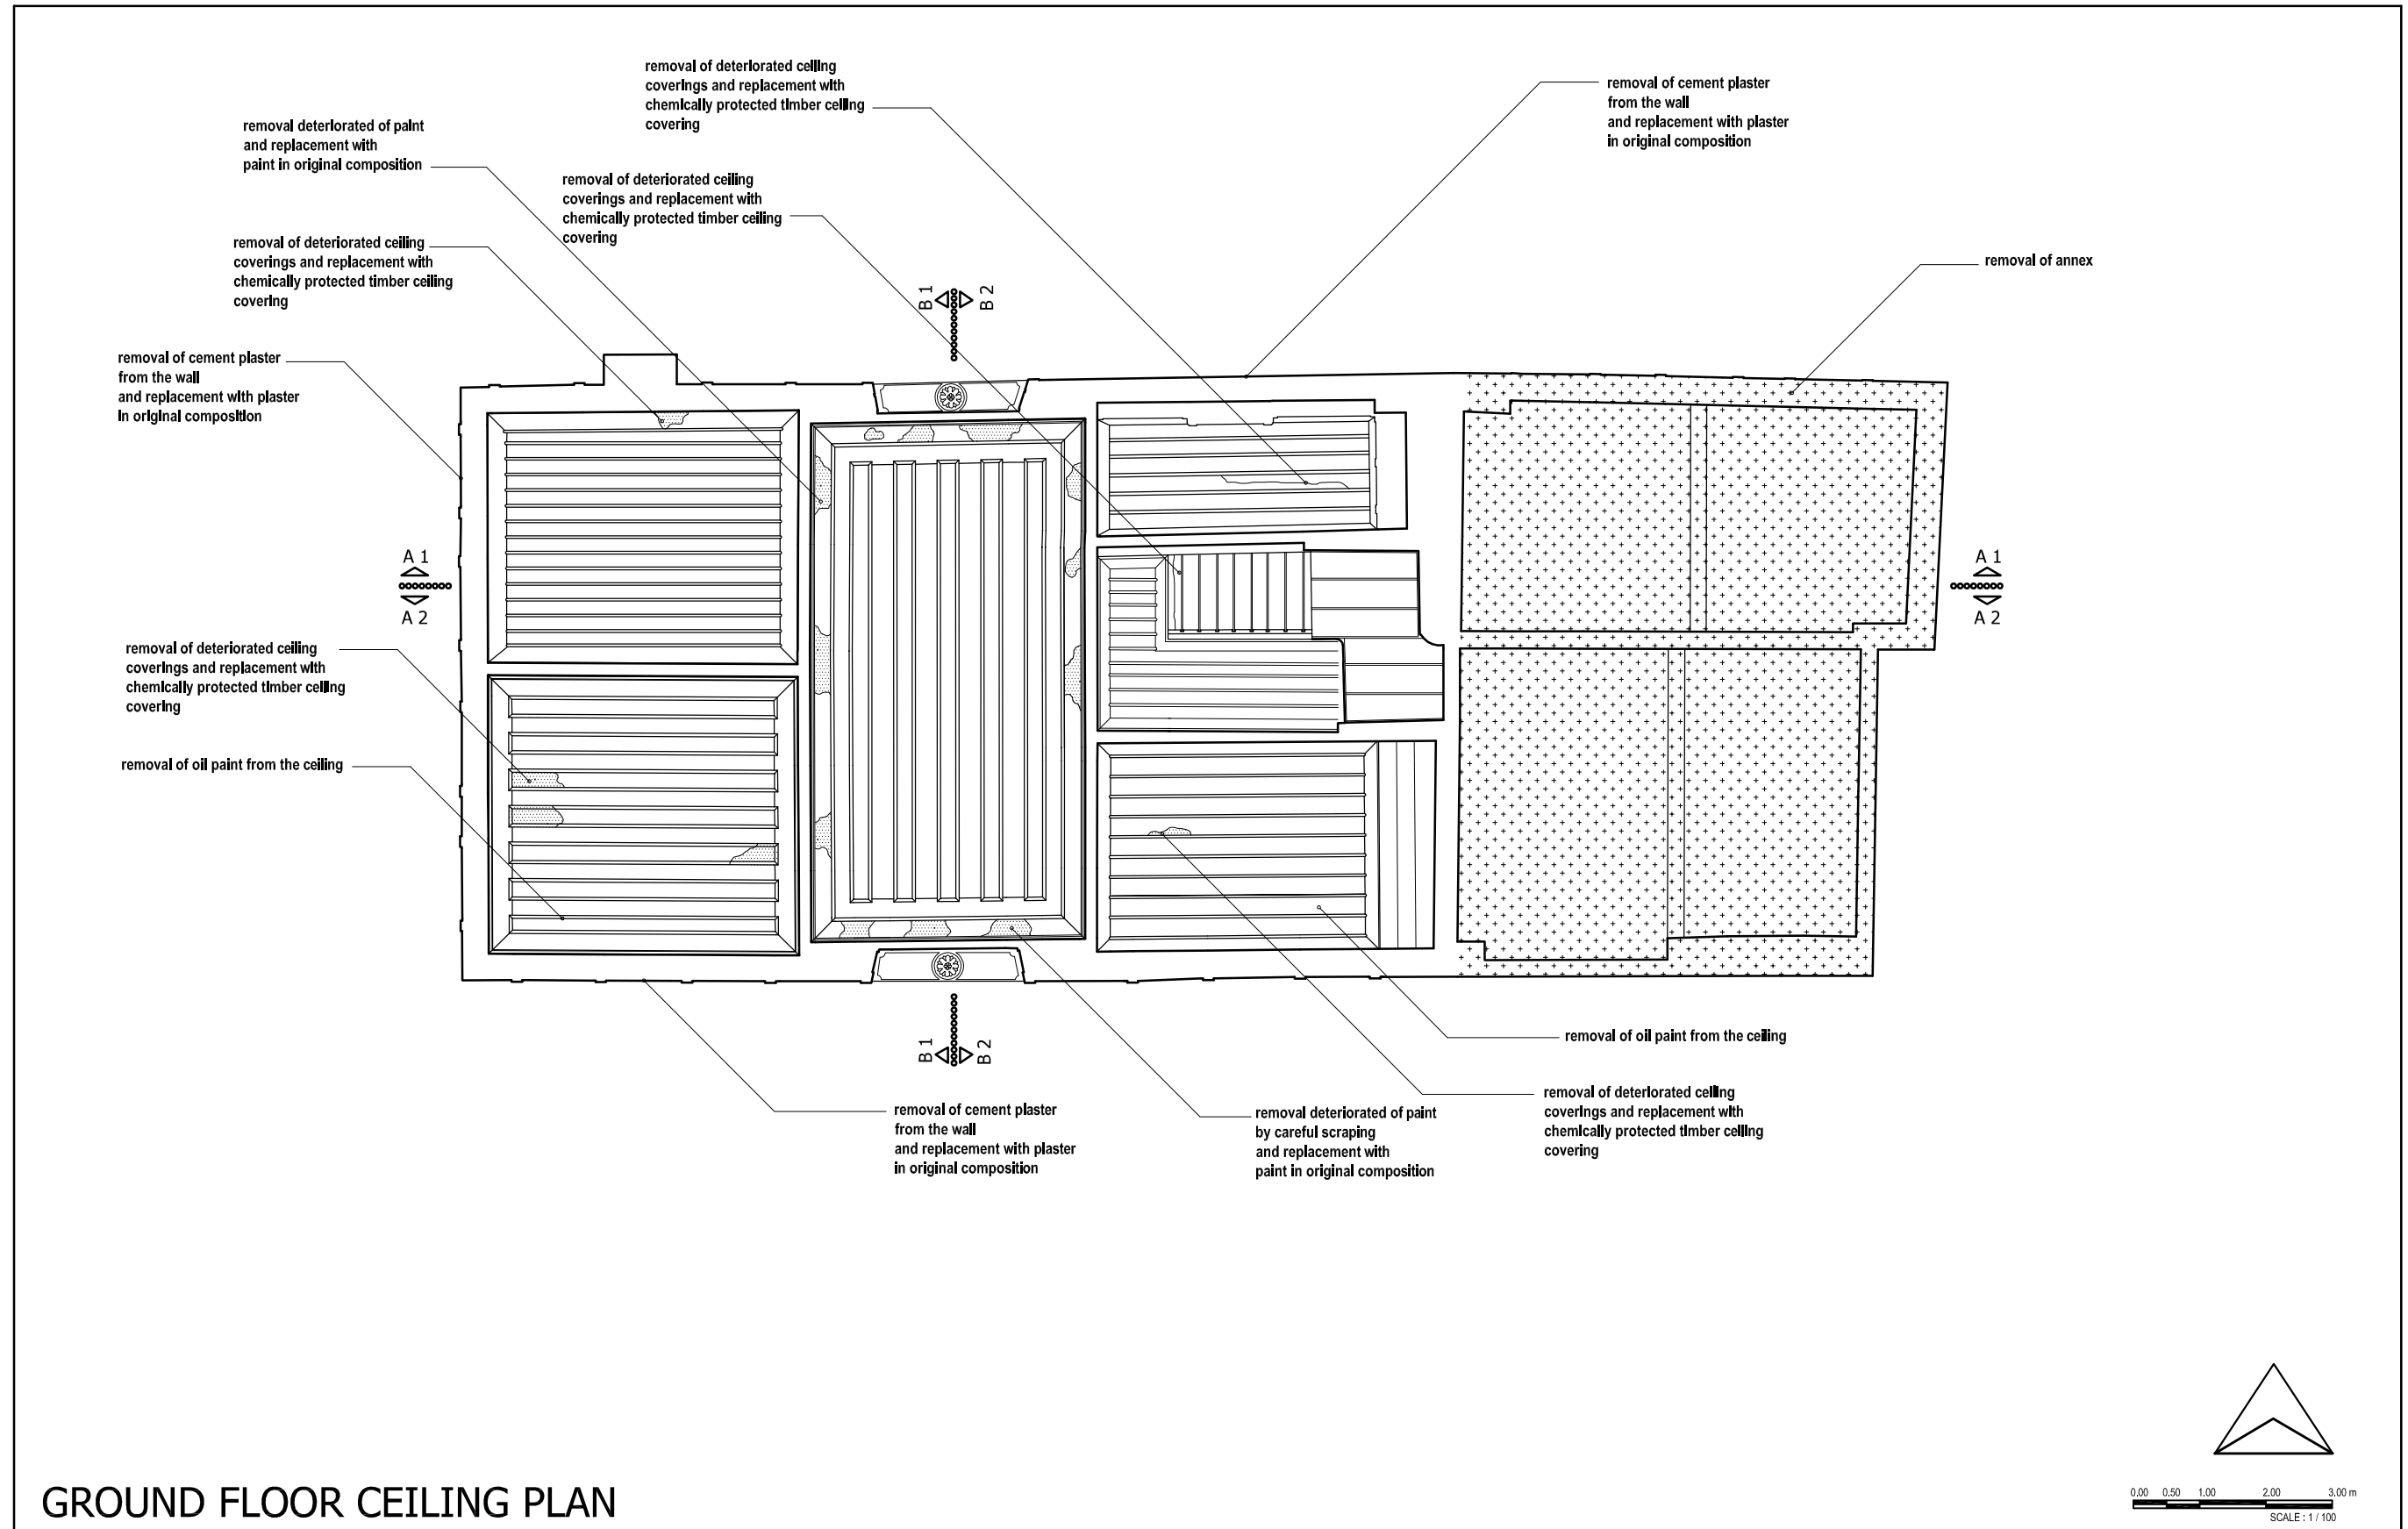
Remedial Measures for Structural Damage and Material Decay- Ground Floor Plan
